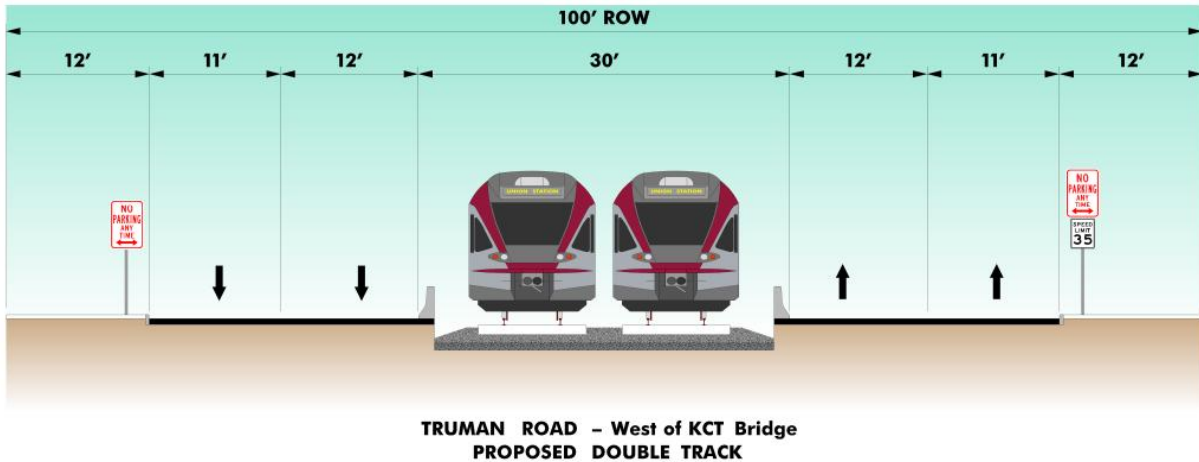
Regional Rail Typical Sections on Truman Road - West of KCT Bridge
